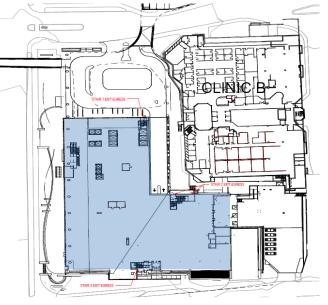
| Site Plan (Courtesty of SmithGroupJJR)
